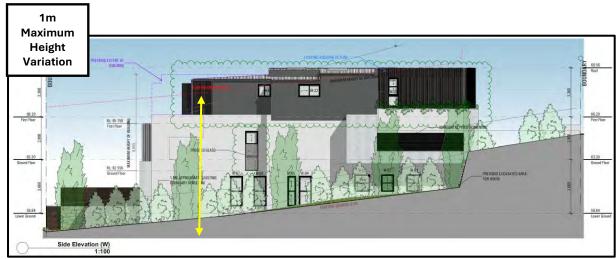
Excerpt Western Elevation Plan, illustrating maximum building height.
